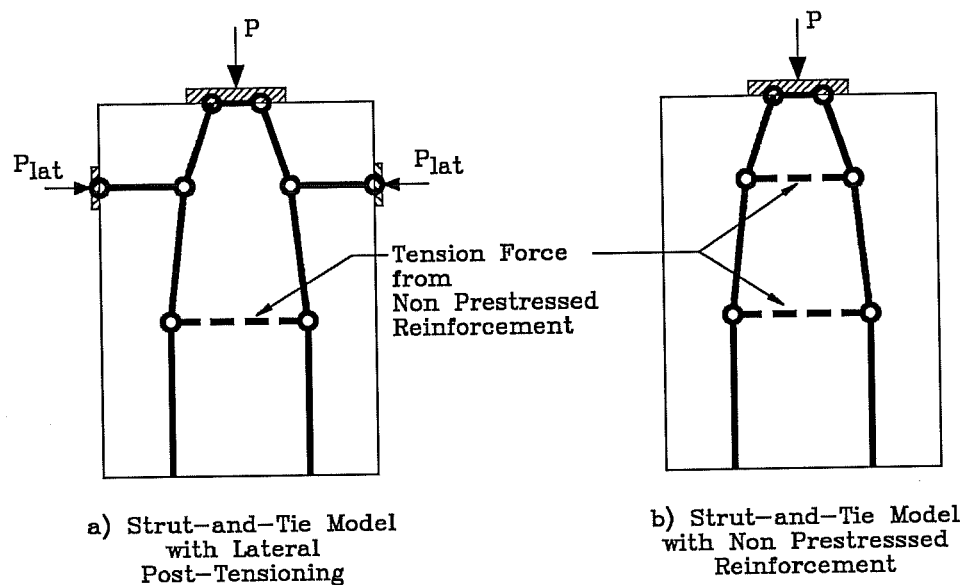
Strut-And-Tie Model for an Anchorage Zone with Lateral Post-Tensioning Compared with an Anchorage Zone with Non-Prestressed Reinforcement Only
